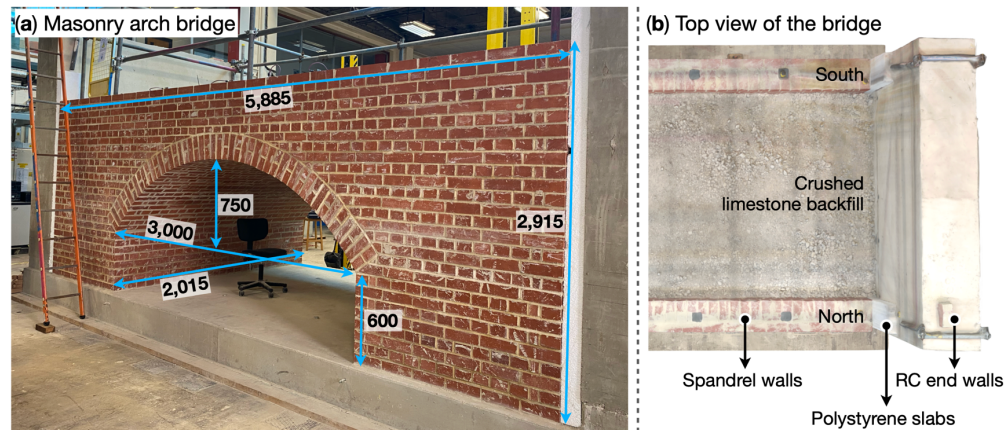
Masonry arch bridge specimen (all units in mm).
